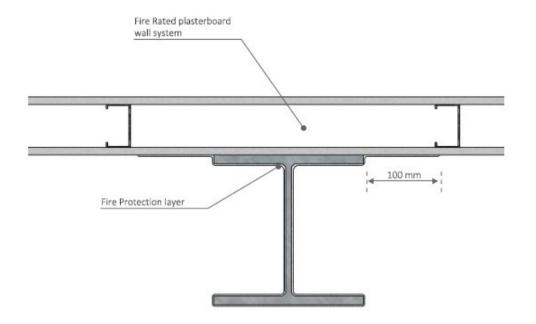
Nullifire SC901/902 protected steel column interfacing with fire rated board wall systems
